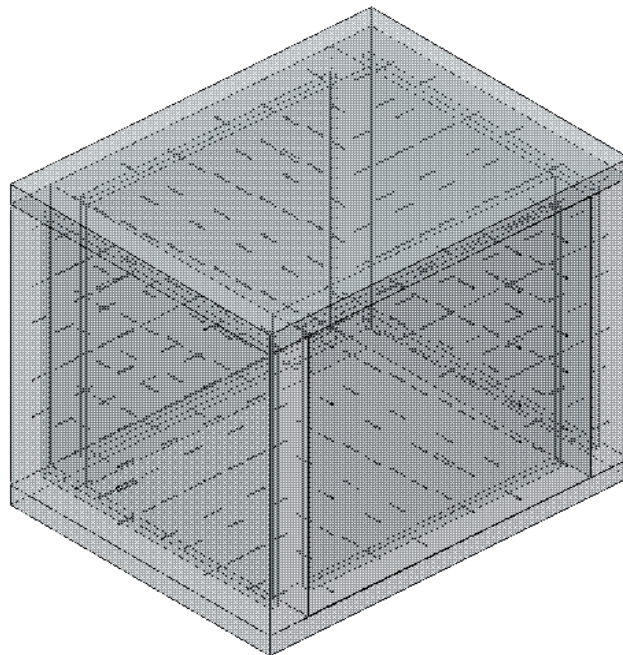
Wall Section Showing Internal Cavity and In-plane Cracks
